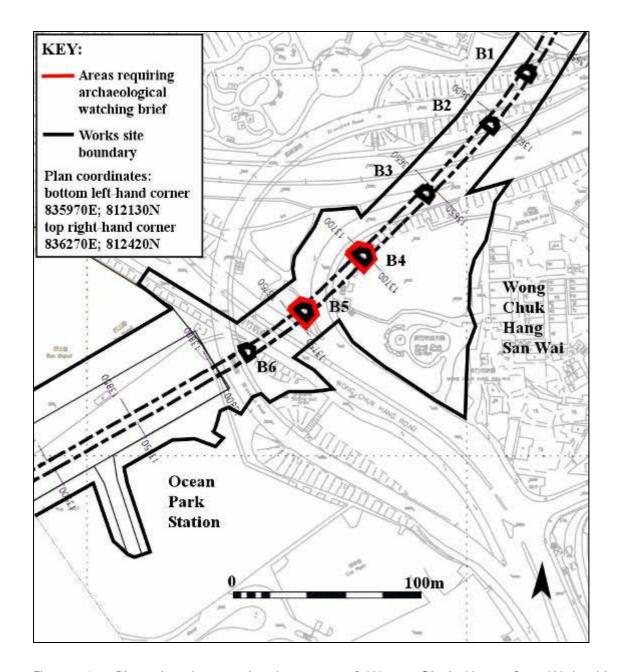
Plan showing works site west of Wong Chuk Hang San Wai with viaduct supporting
